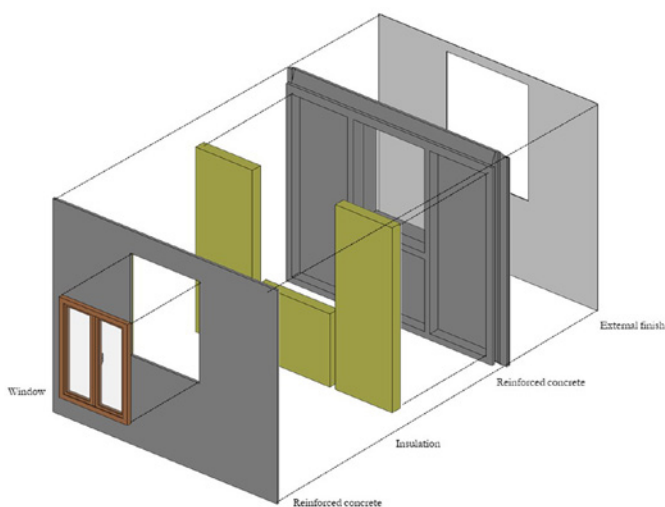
Axonometric exploded view of the Balency & Schul system panels made by Revit.
